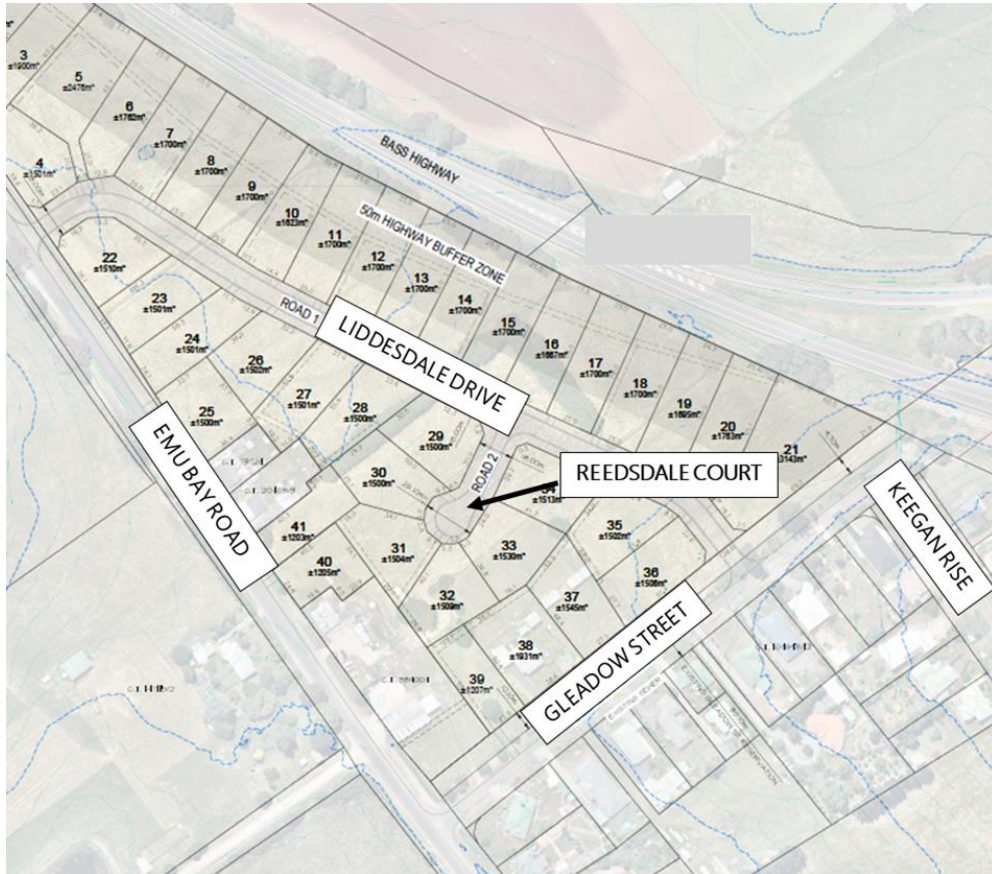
Two new public roads within the 4 Gleadow Street subdivision in Deloraine
